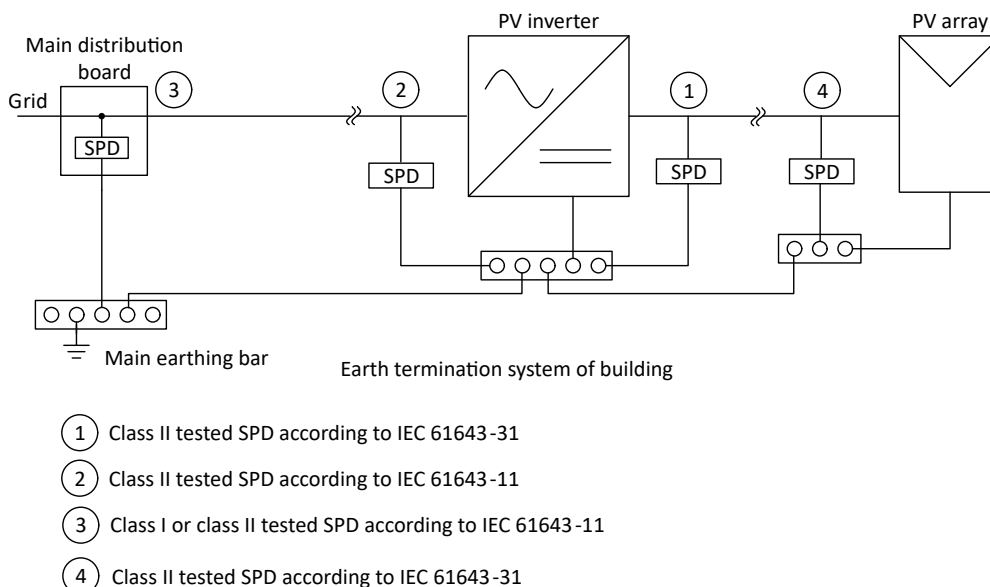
Installation of SPDs in the Case of a Building without External LPS
